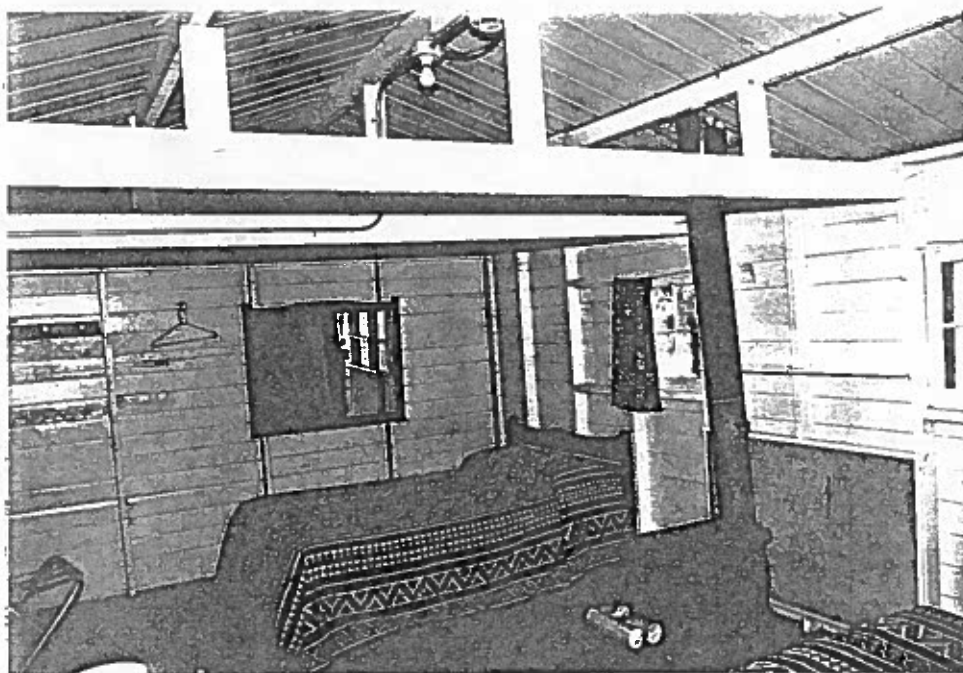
Looking south at the interior of cabin 79. Note the dimensional frame in the interior. Also, note the conduit run along the timber and up on the ceiling.
